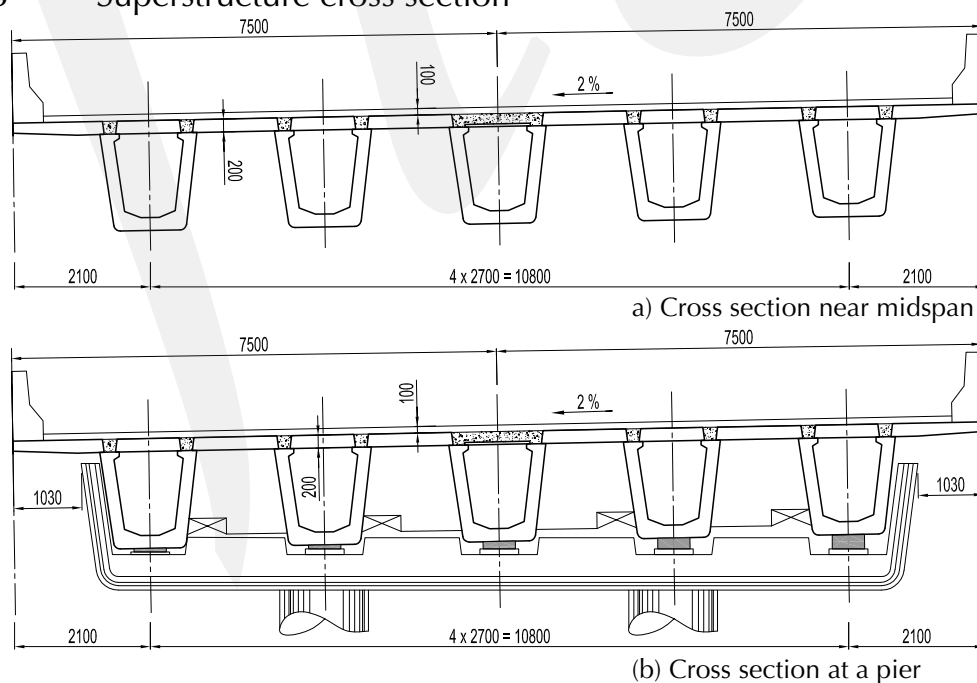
Cross section of the bridge. Note: All dimensions are in millimeters . 1 mm = 0.0394 in.
